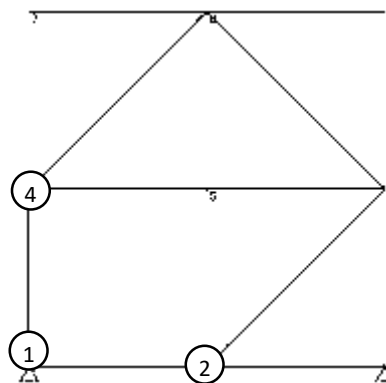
A Kinematically Stable Planar Truss with a Non-Triangular Layout
